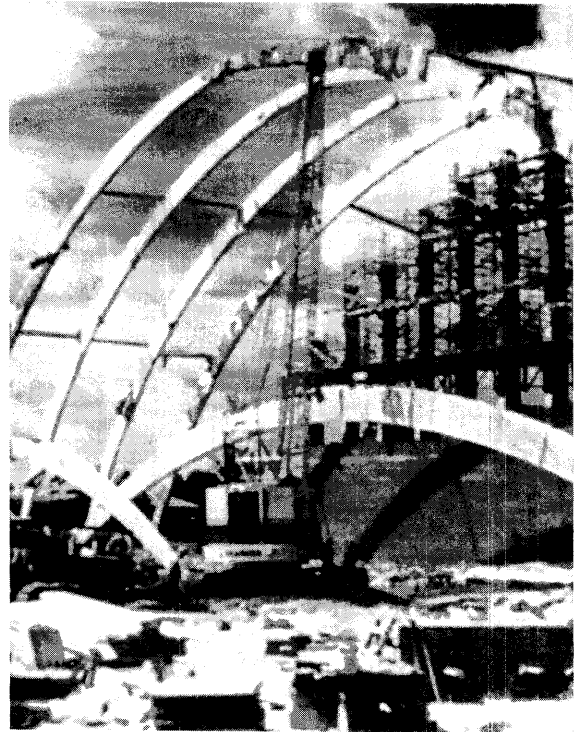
Glued laminated timber beam. (Courtesy of American Institute of Timber Construction)
